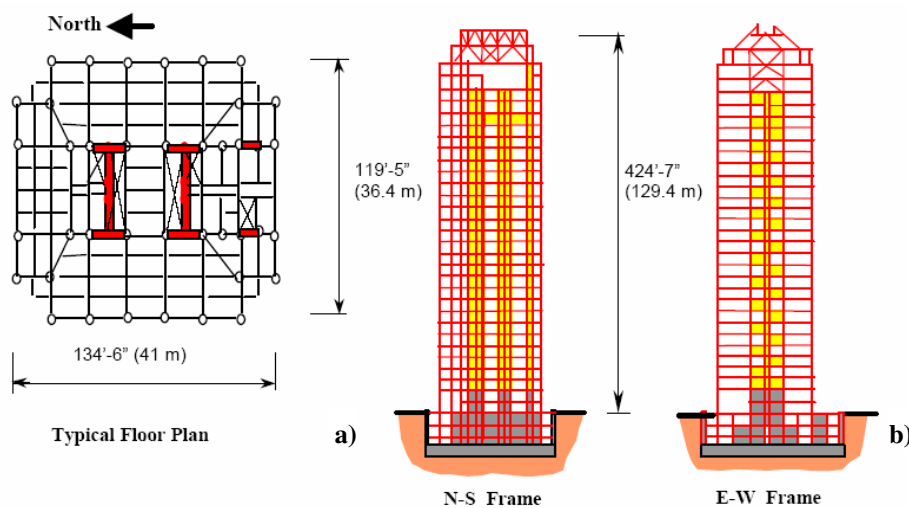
Structural plan view (a) and vertical sections (b) of the 35-storeys building in Kobe
